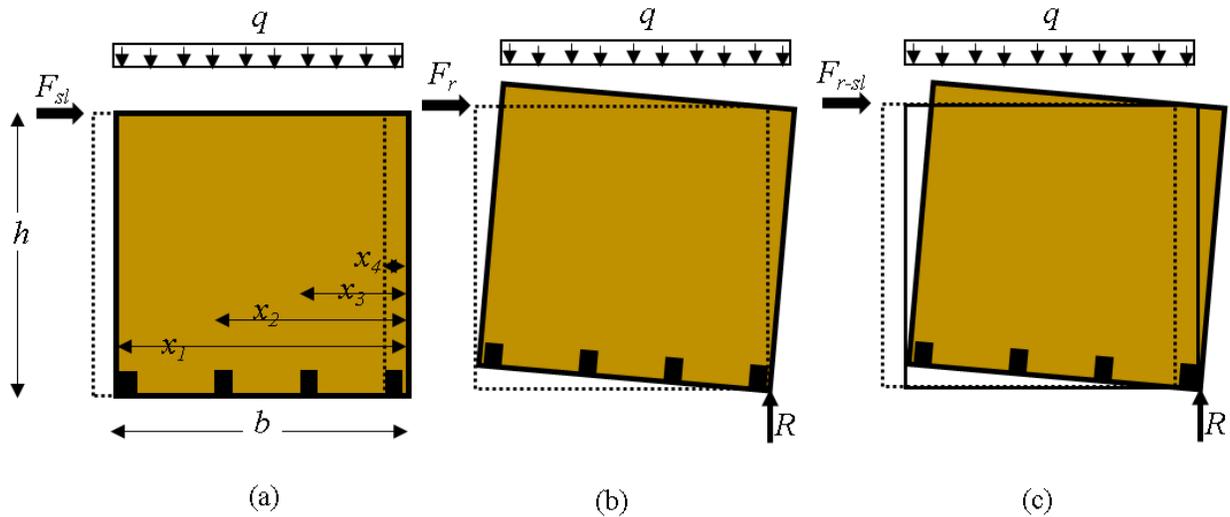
CLT wall kinematic motions: (a) sliding, (b) rocking and (c) combined sliding-rocking
